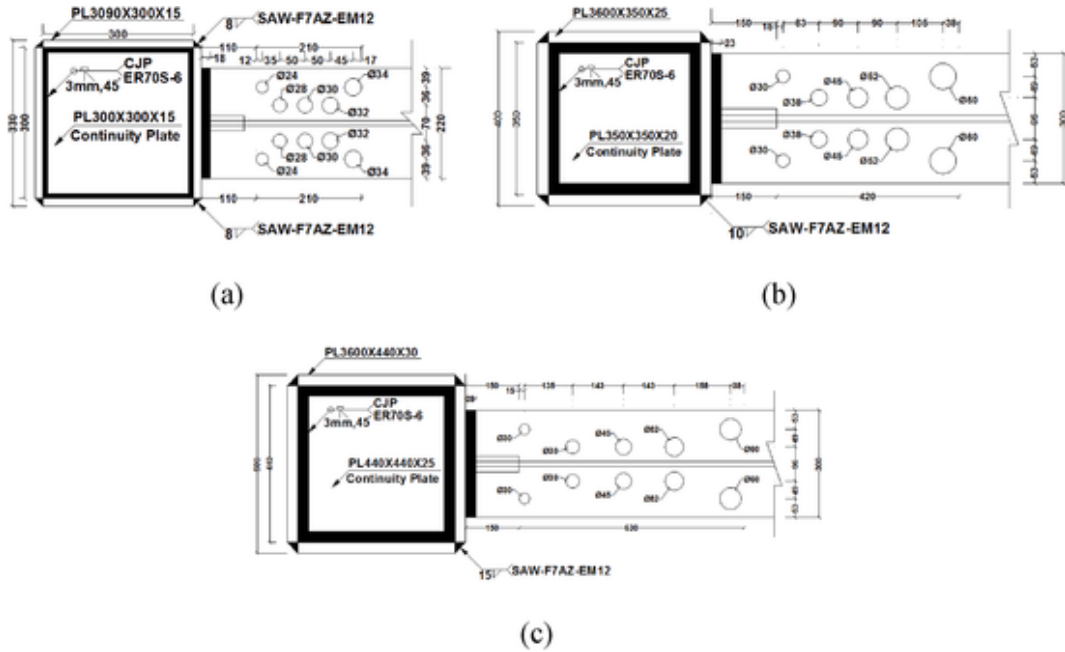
Fabricating details for a) SRDFC1, b) SRDFC2, and c) SRDFC3.
